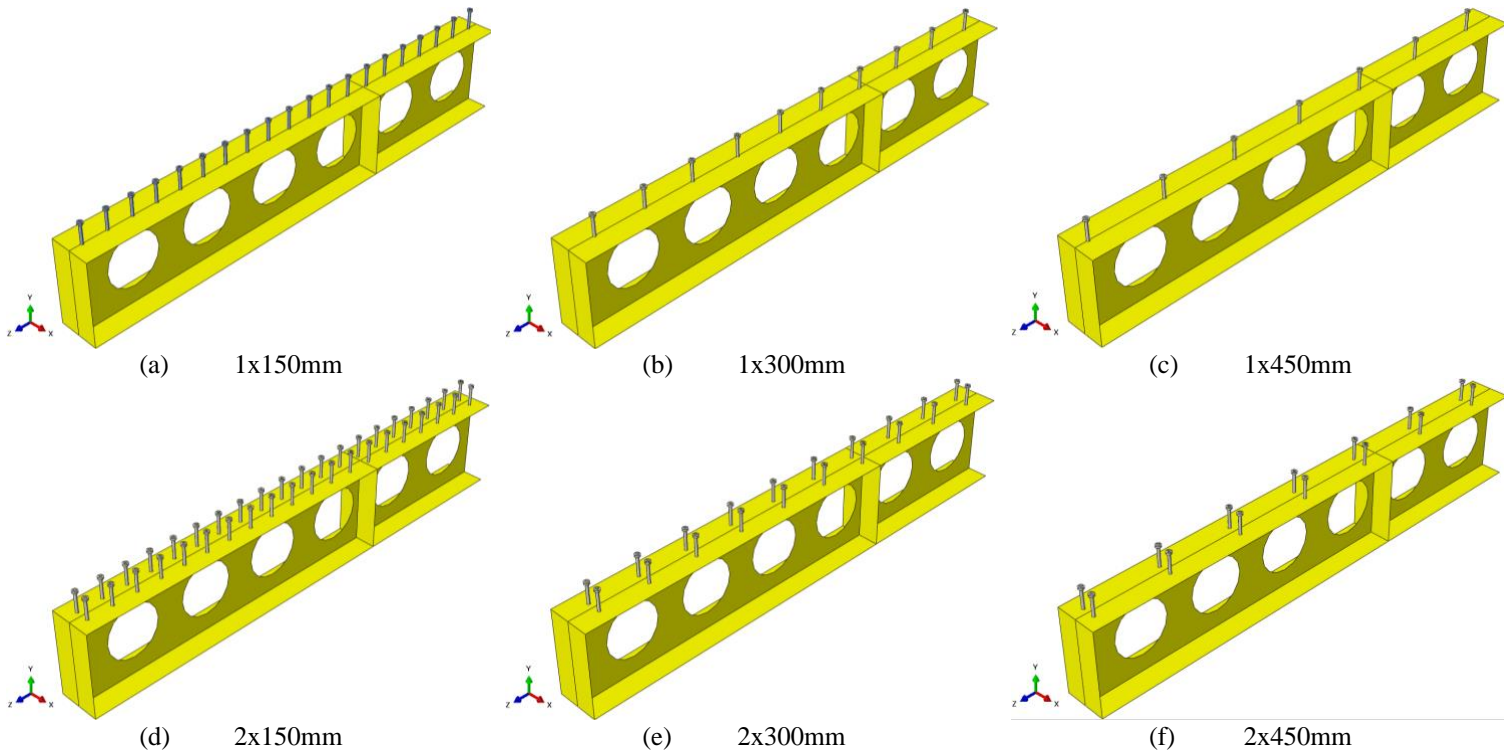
Shear studs spacing for parametric study, considering symmetry at mid-span
